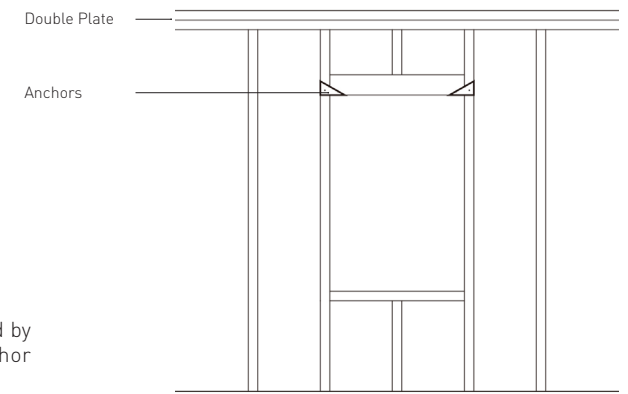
Openings supported by frame anchors, drawn by author (American wood council, 2001)
